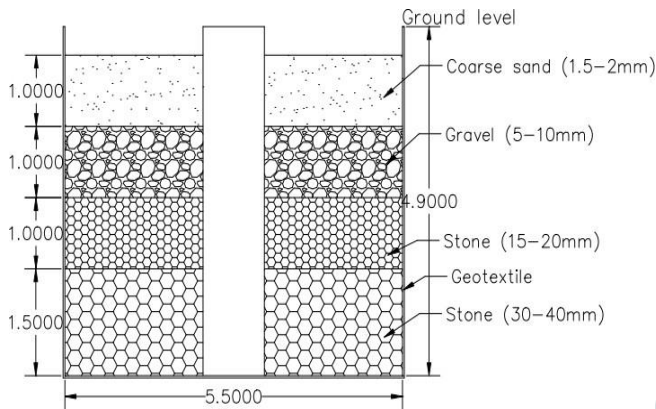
Sectional view of recharge pit near new block (all dimensions are in m)
